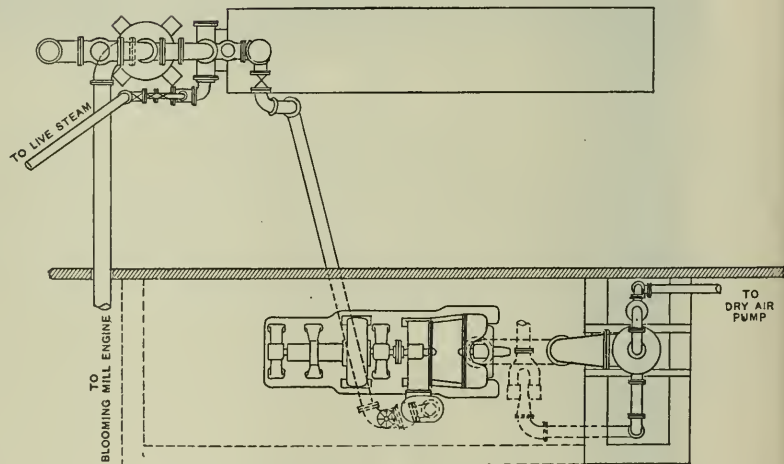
PLAN AND ELEVATION OF LOW-PRESSURE TURBINE INSTALLATION
